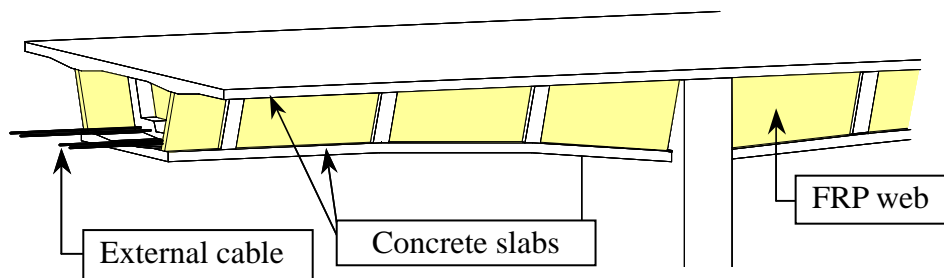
Boxed-sectioned prestressed concrete girder bridge with GFRP web panel
